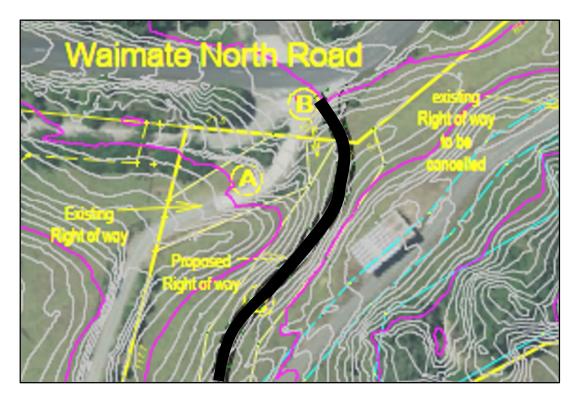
Proposed new location for access to dwellings on 797 and 797A Waimate North Road.
